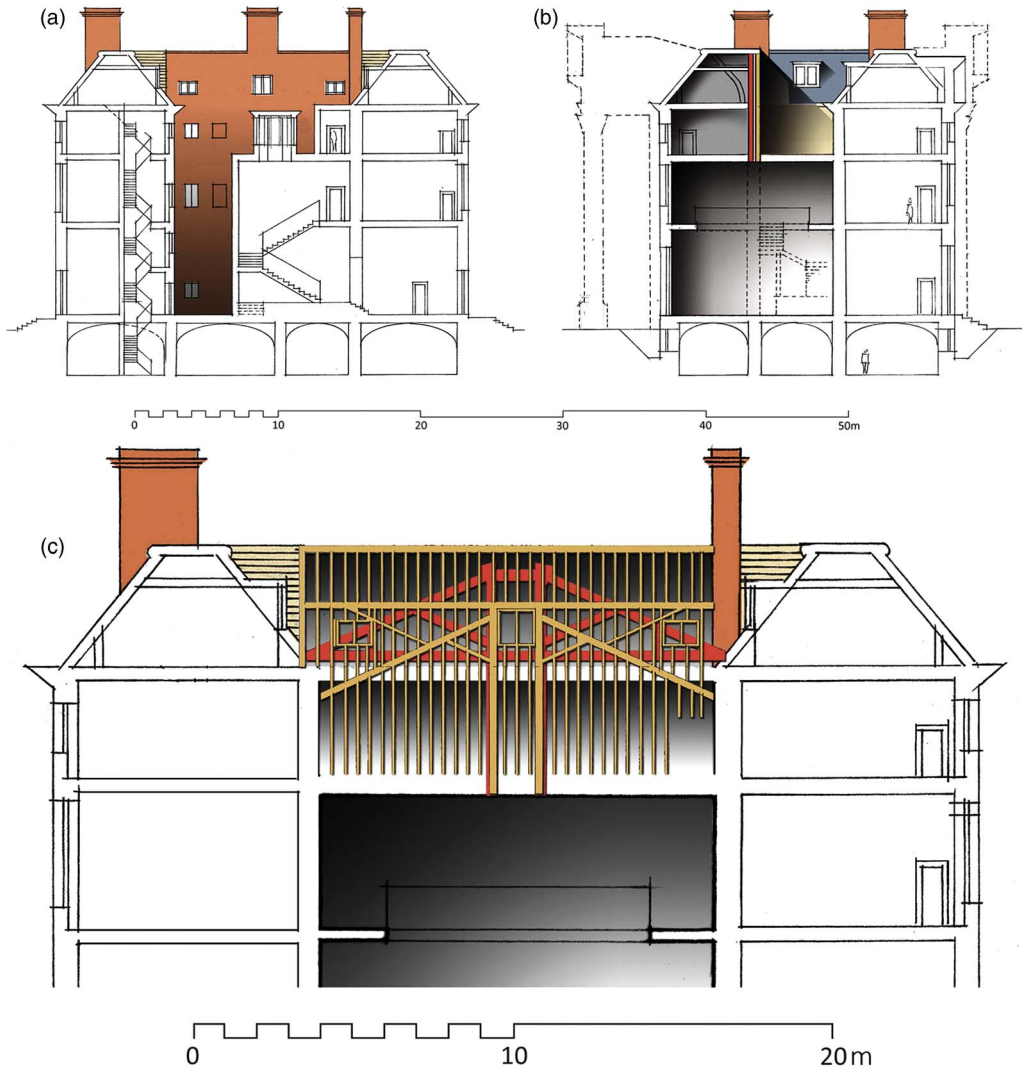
Moor Park: sections showing the position of Thornhill's structural partition, replacing the demolished brick wall, with the later strengthening truss shown in red. (a) North-south looking west before alteration; (b) east-west looking north after alteration; (c) north-south looking west after alteration. Drawings: David Wrightson
